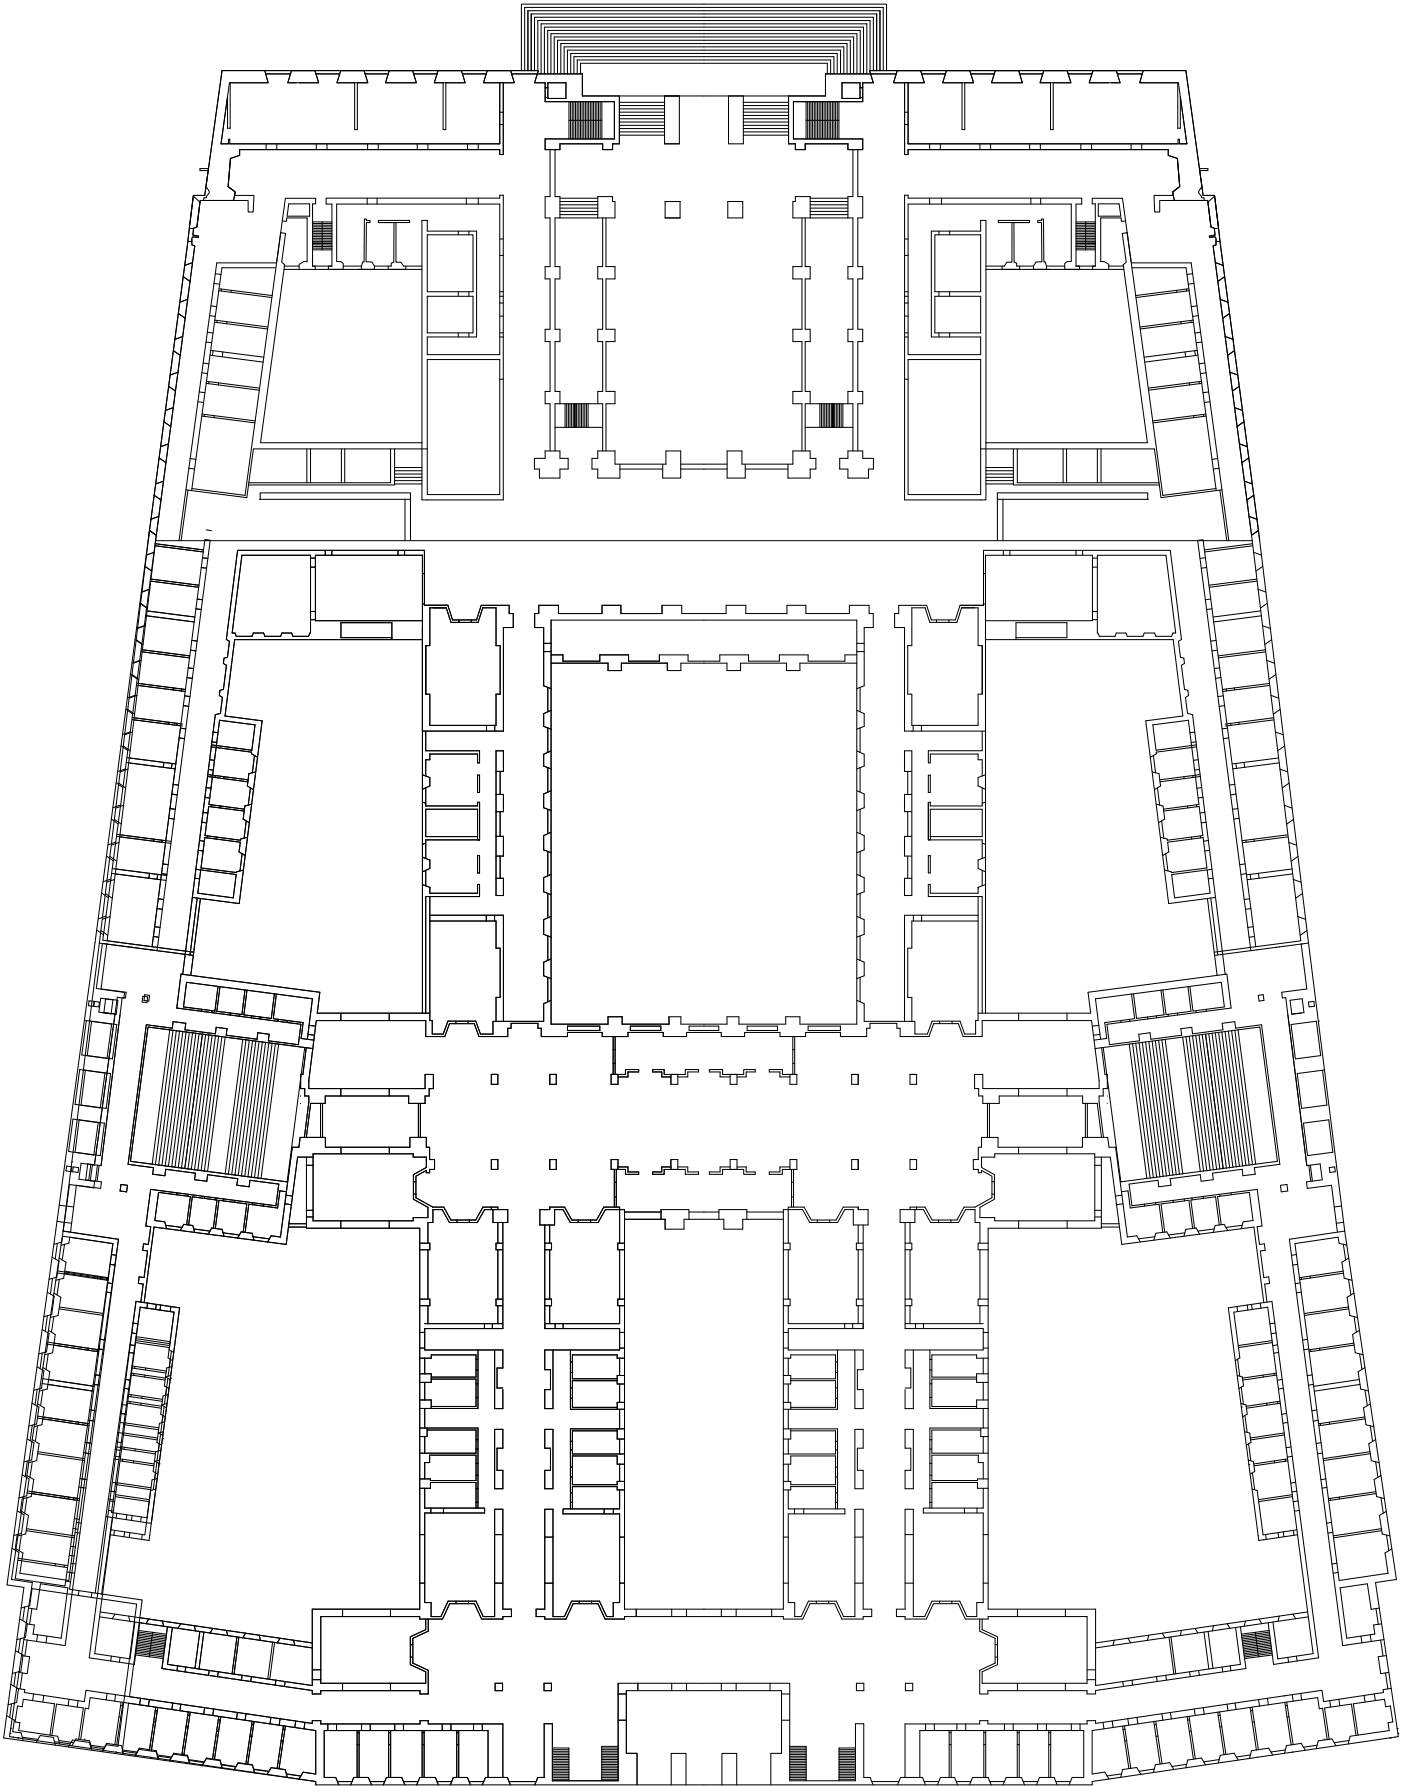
Raised Floor Plan, 5.50 m above the road level.
